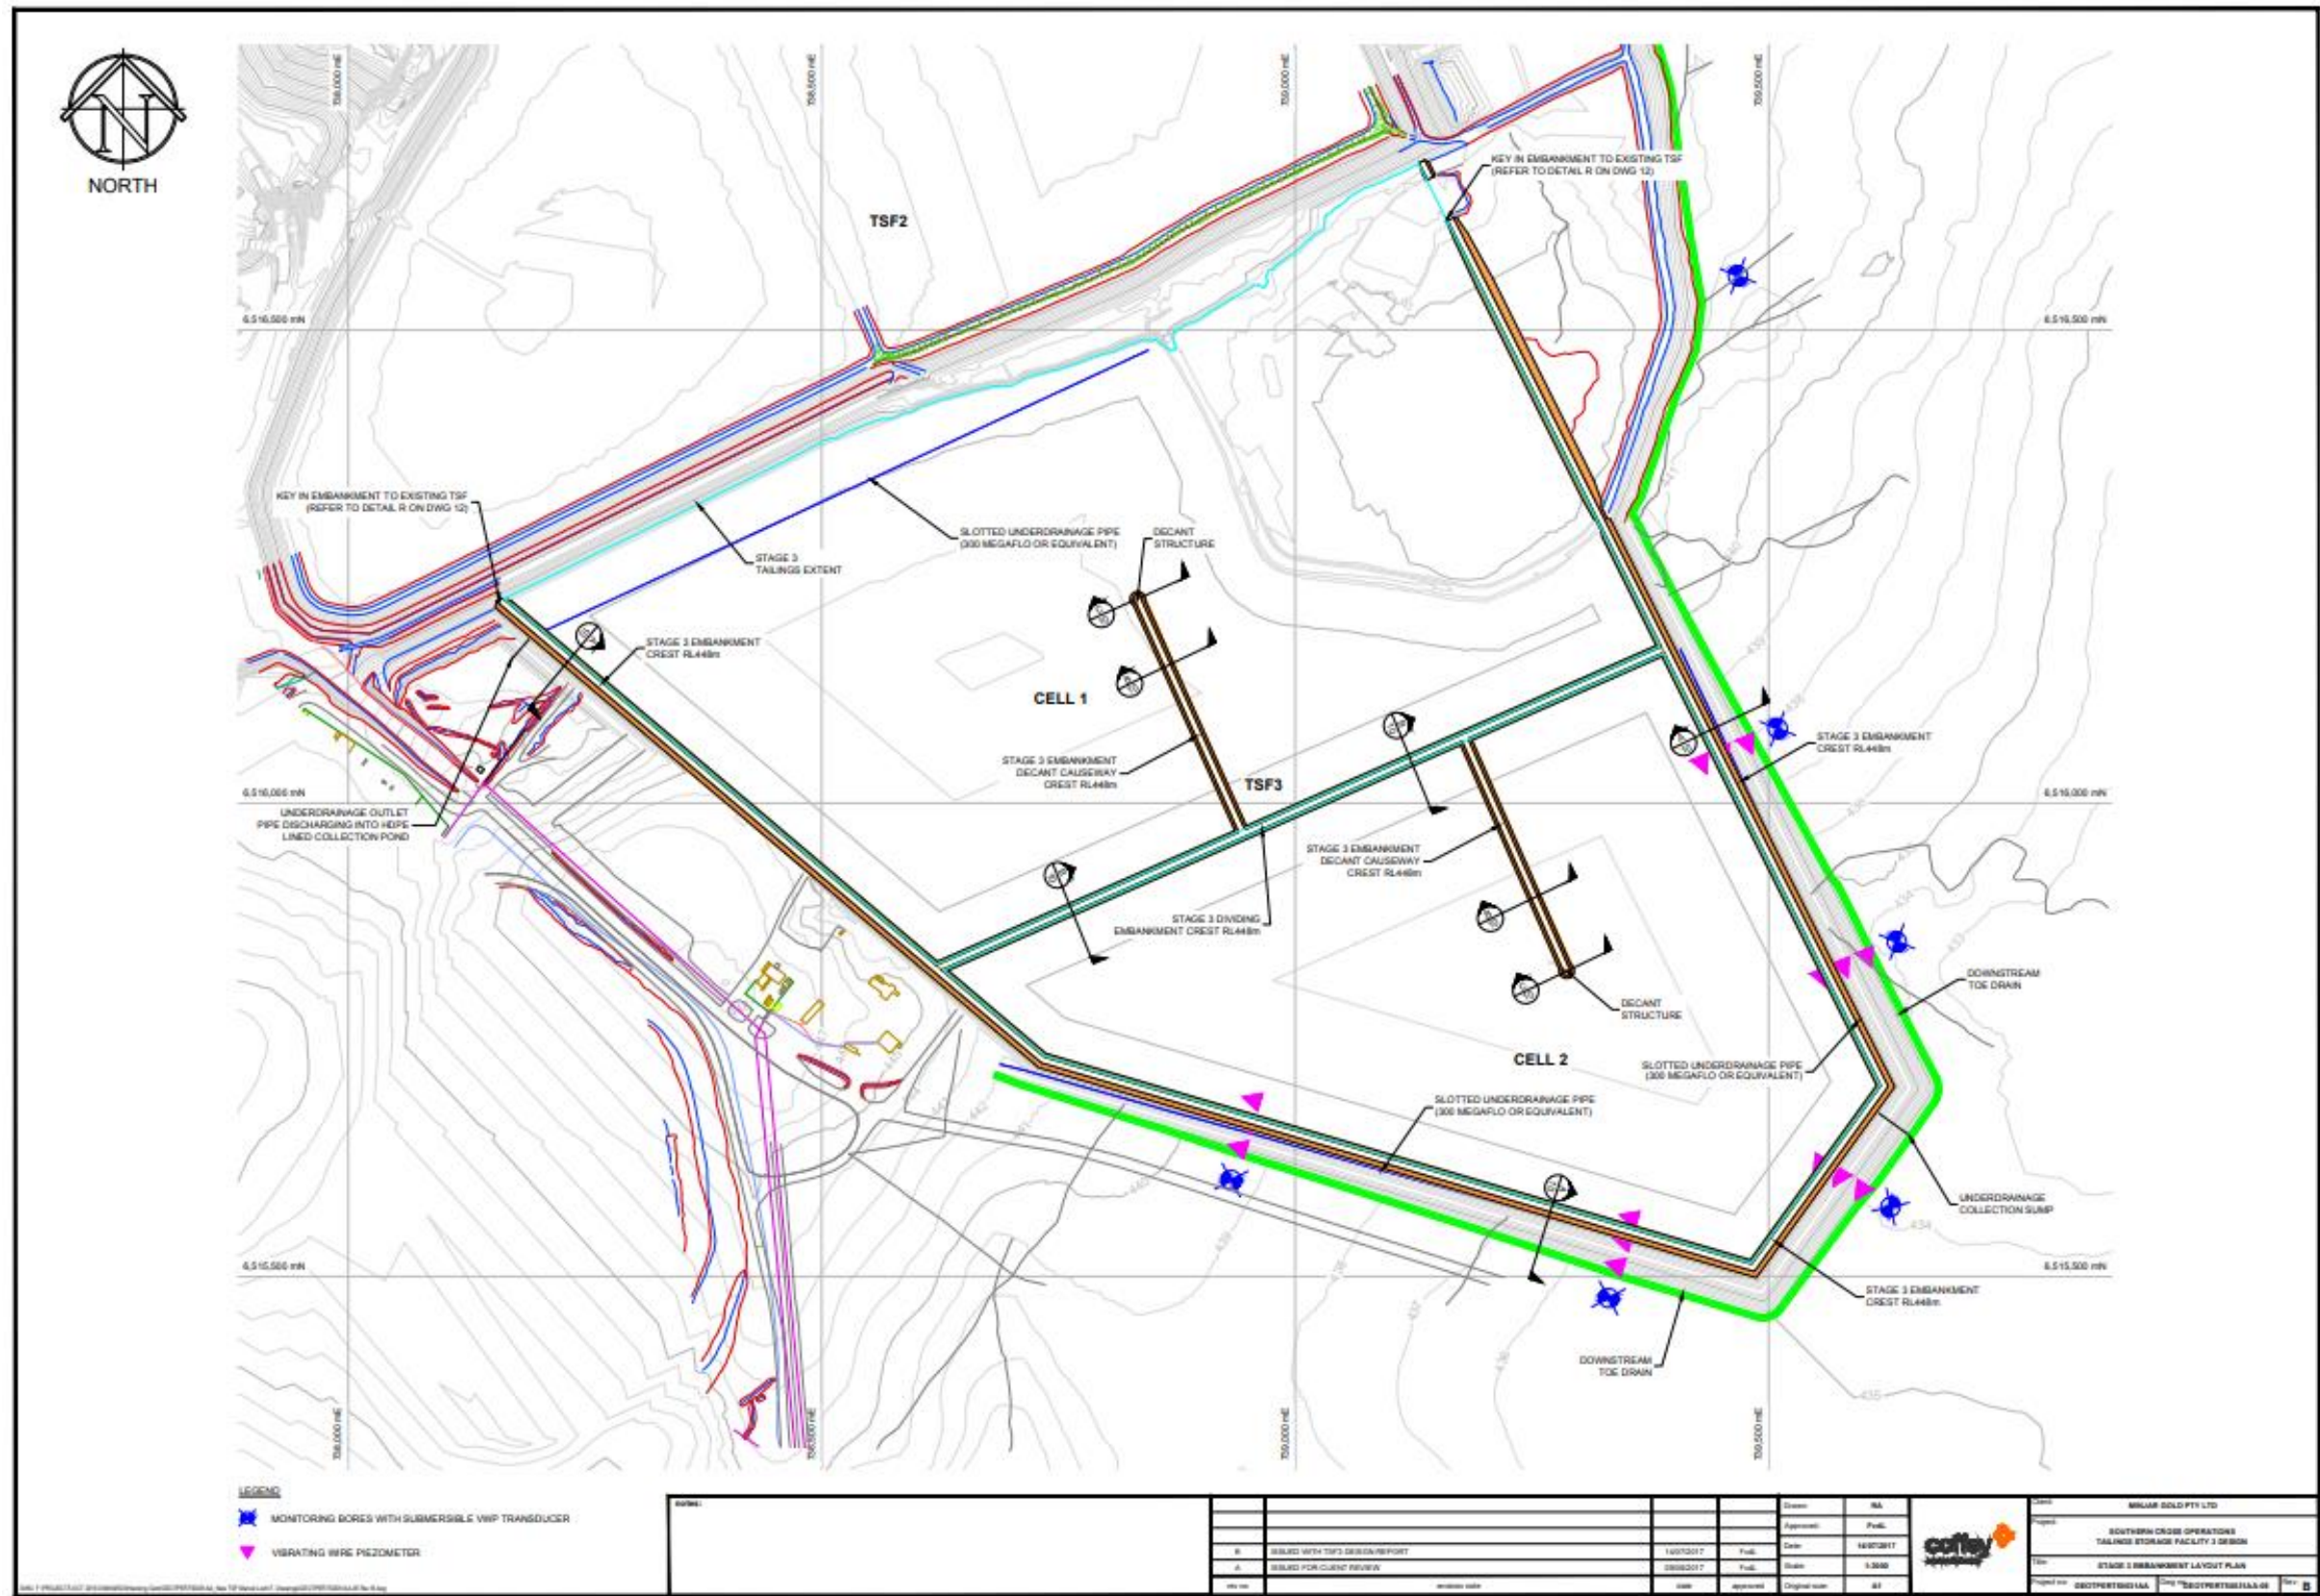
TSF 3 Stage 3 Embankment Layout plan
